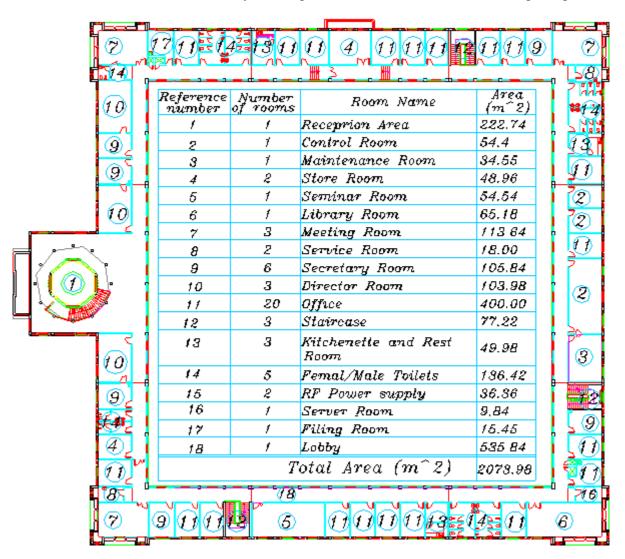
The first floor of SESAME building with the offices, meeting rooms, control room and library.
